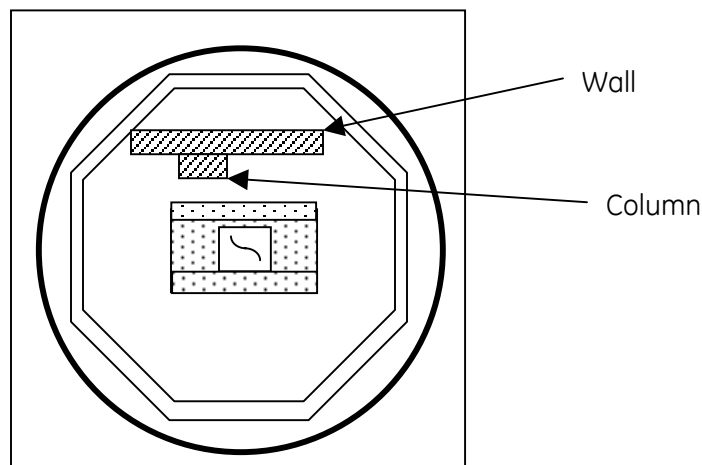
Top View of Pool with Wall and Column (Not to Scale)
